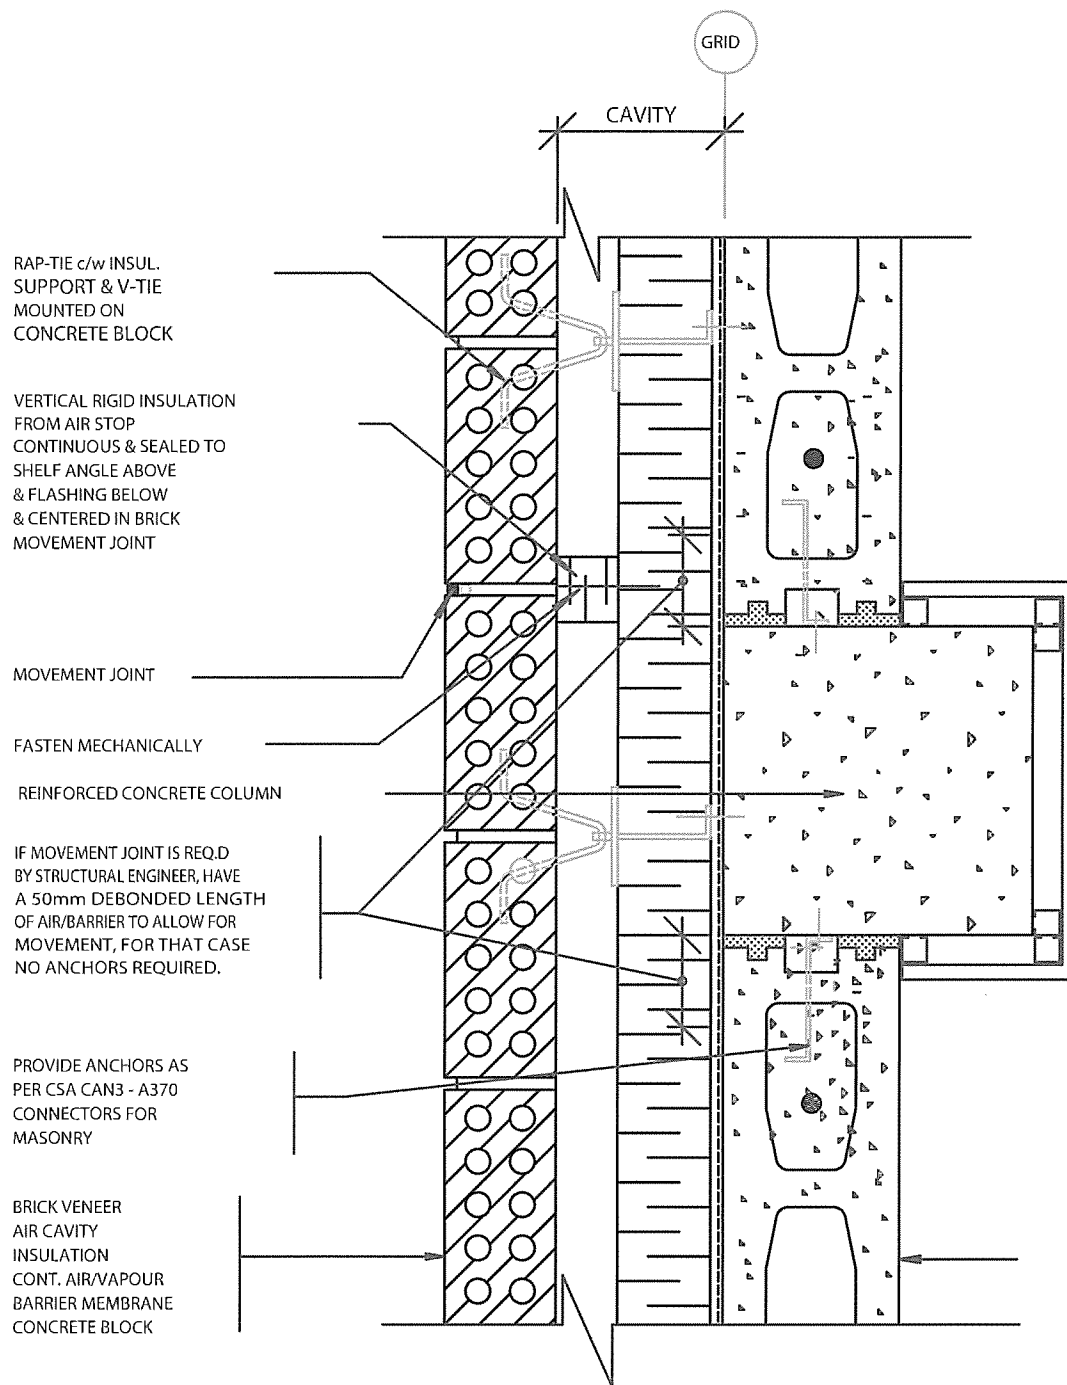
BRICK VENEER/CONCRETE BLOCK - CONTROL JOINT/AIR STOP
